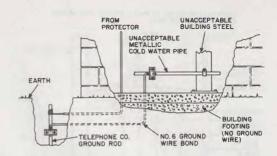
♦Unacceptable Water System or Building Ground (Power Service Not Grounded)♦
